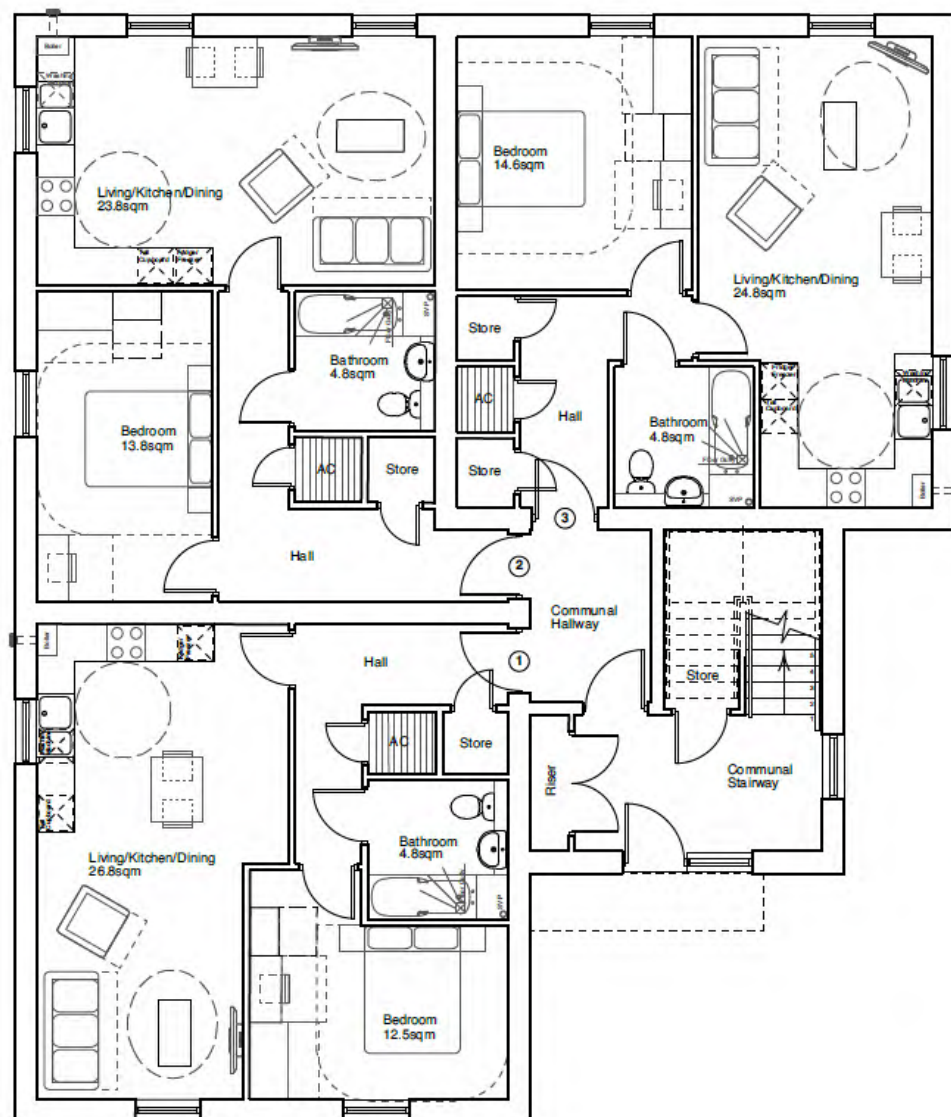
Typical Floor Plan (Image courtesy of Quattro Design Architects)
